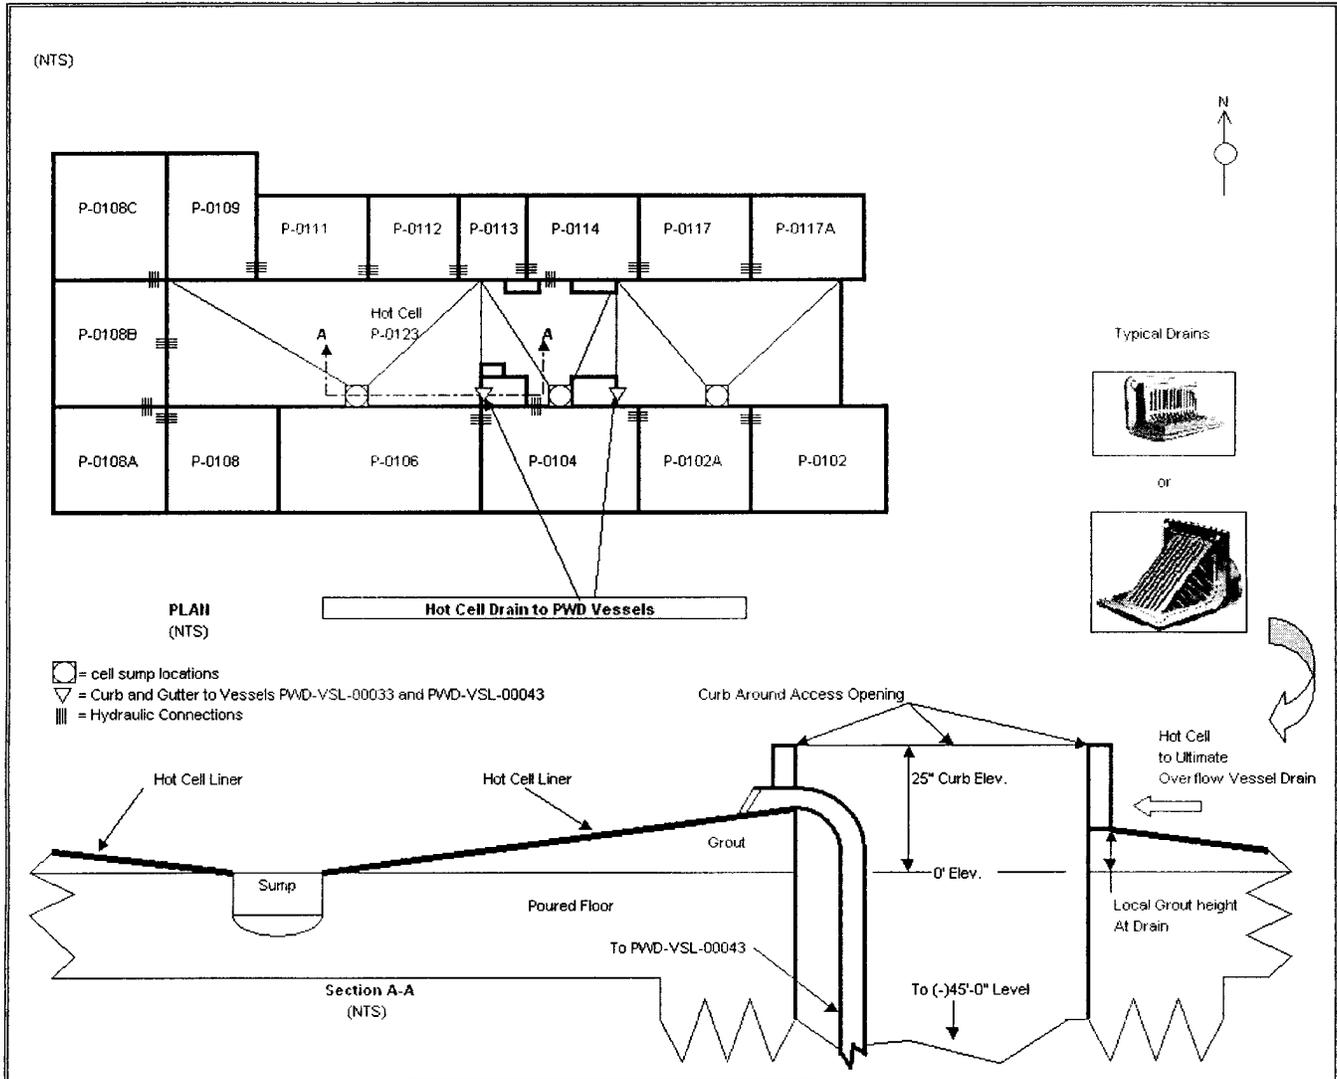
Hydraulic Connections at Elevation 0 ft, 0 in.
